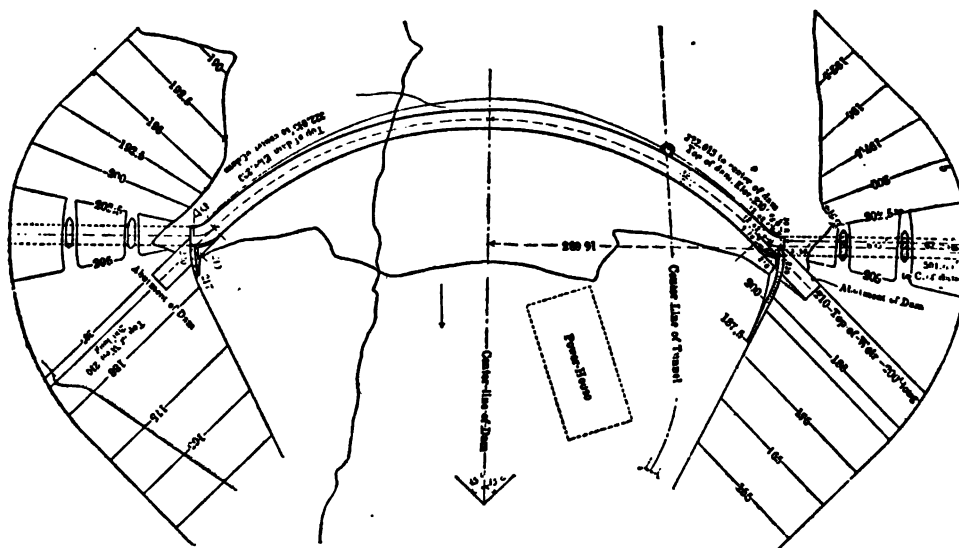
PLAN OF ROOSEVELT DAM, ARIZONA.
